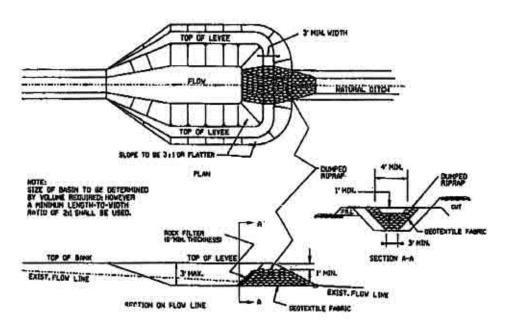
Sediment trap detail (Adapted from: AHTD, 2001)
